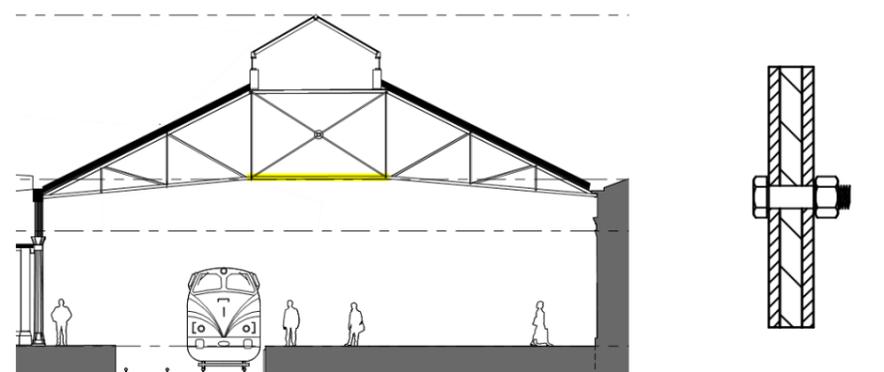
Strengthening detail to bottom boom of 6No. trusses at Manchester end of Roof A
